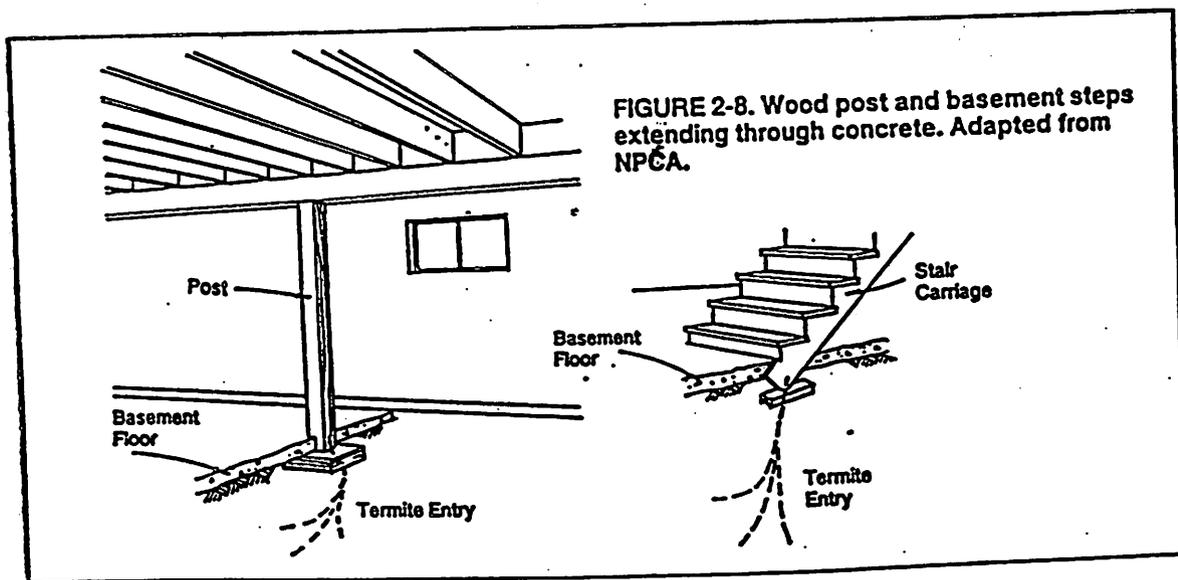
Wood post and basement steps extending through concrete. Adapted from NPCA.
